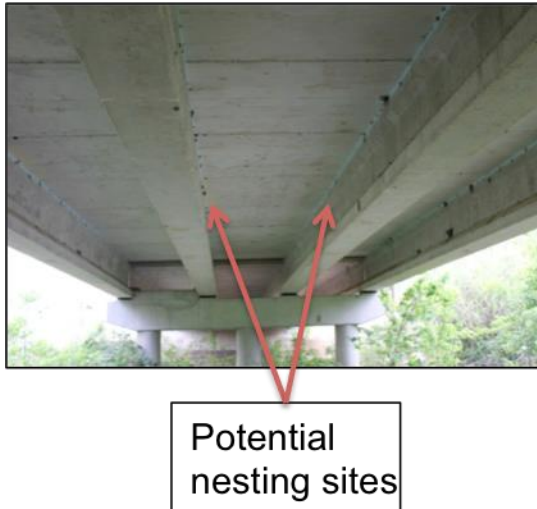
Illustration of a multi-girder concrete bridge design type
